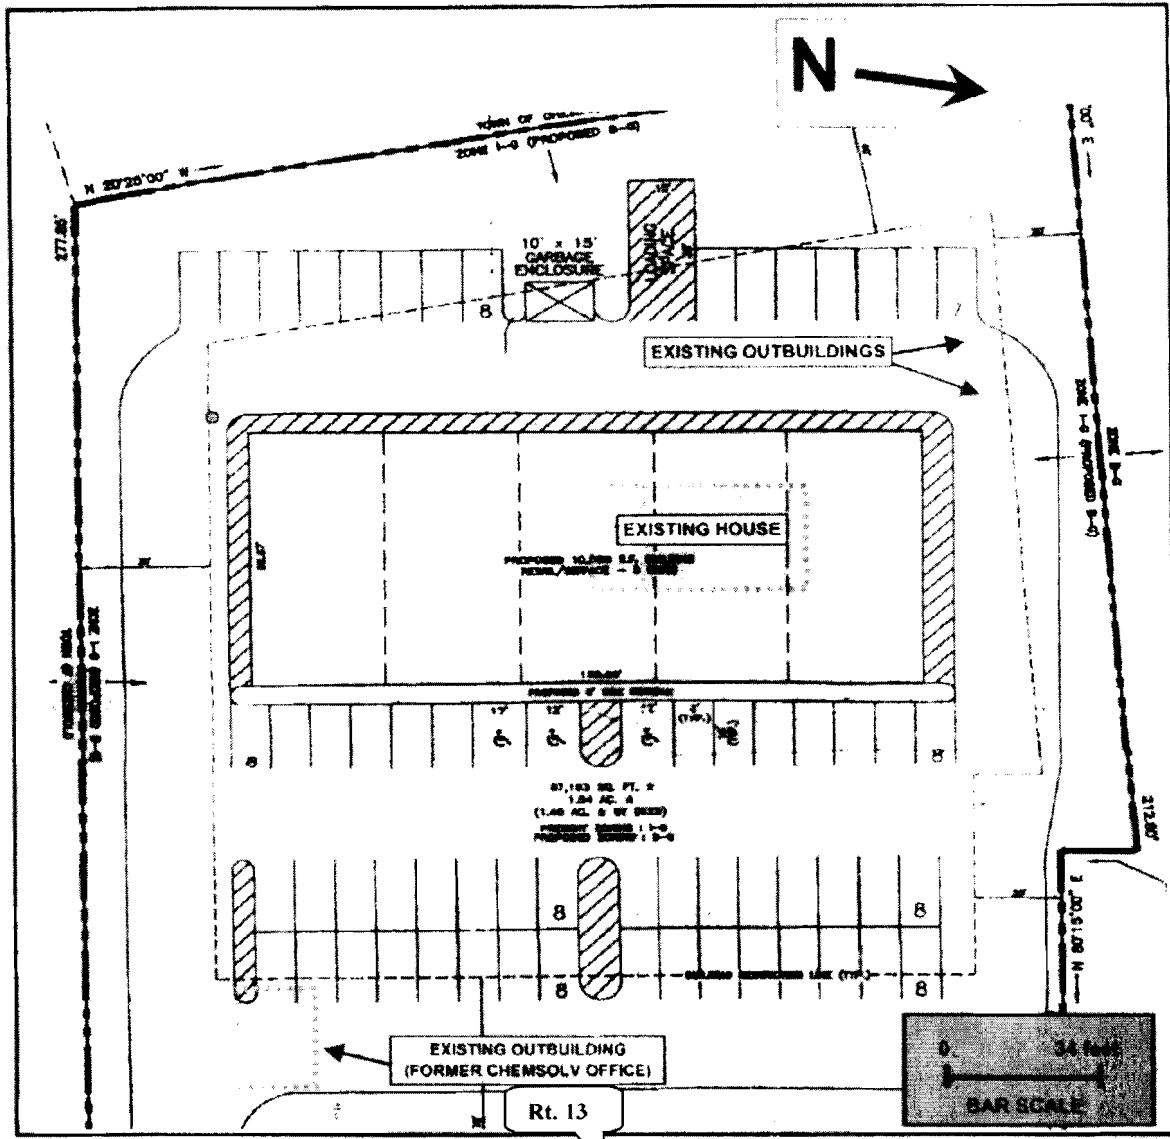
SOIL BORING/SOIL GAS LOCATION SKETCH AND PREVIOUS/EXISTING/FUTURE SITE FEATURES SKETCH
